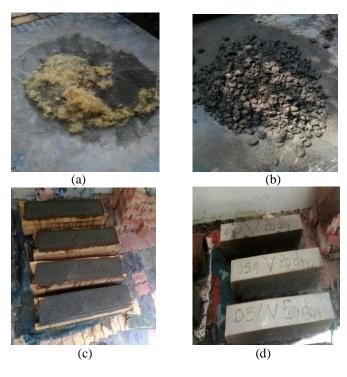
Casting procedures (a) Mixing of sisal fibre (b) Concrete mix (c) Casting of beams (d) Samples cast
